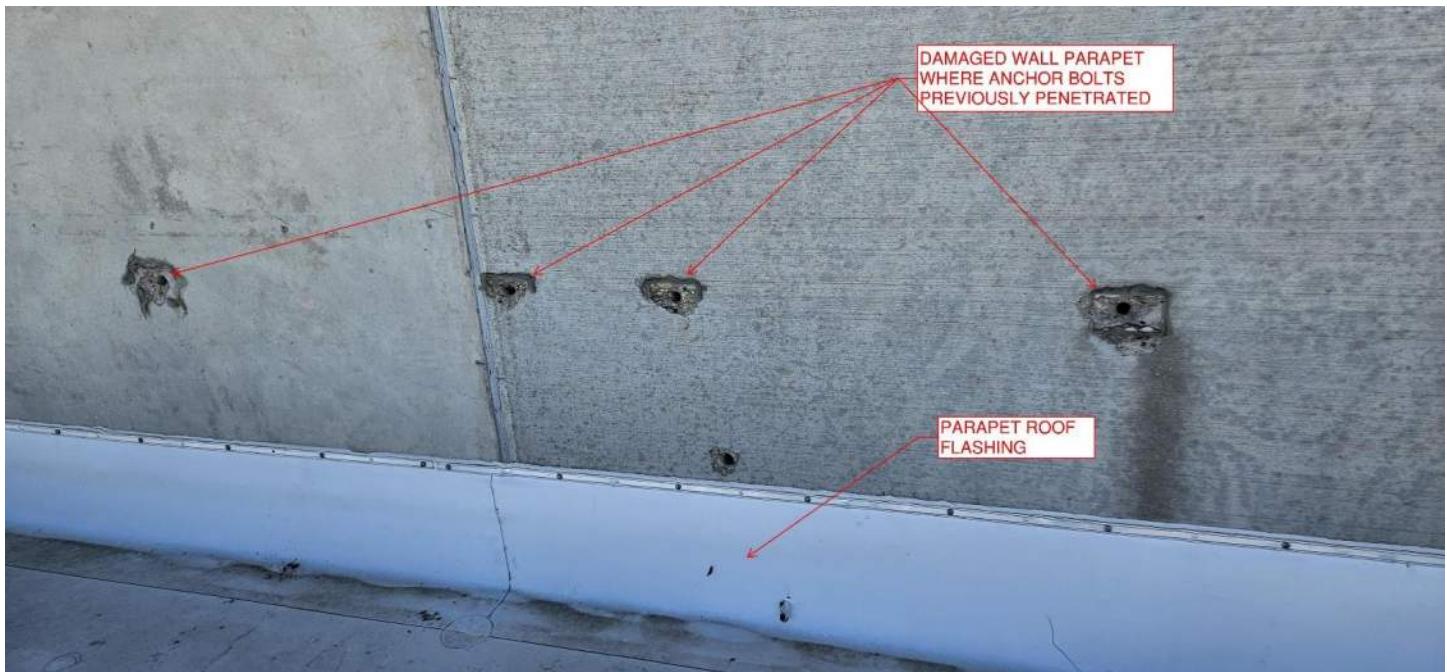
WALL PENETRATIONS AT THE EAST PARAPET
